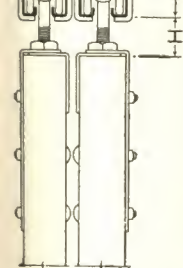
Cross-section showing wall bracket attachment, with out weatherstrip, of two parallel sliding doors. See page 143 for dimensions.
